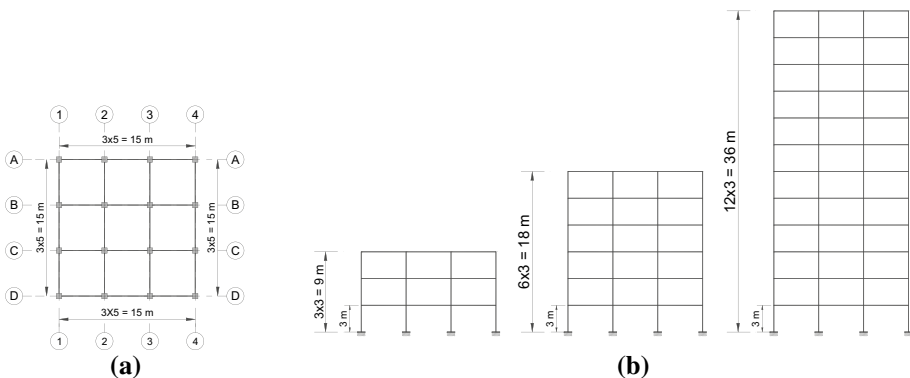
Three-, six- and twelve-story buildings: a typical floor plan, b elevation
